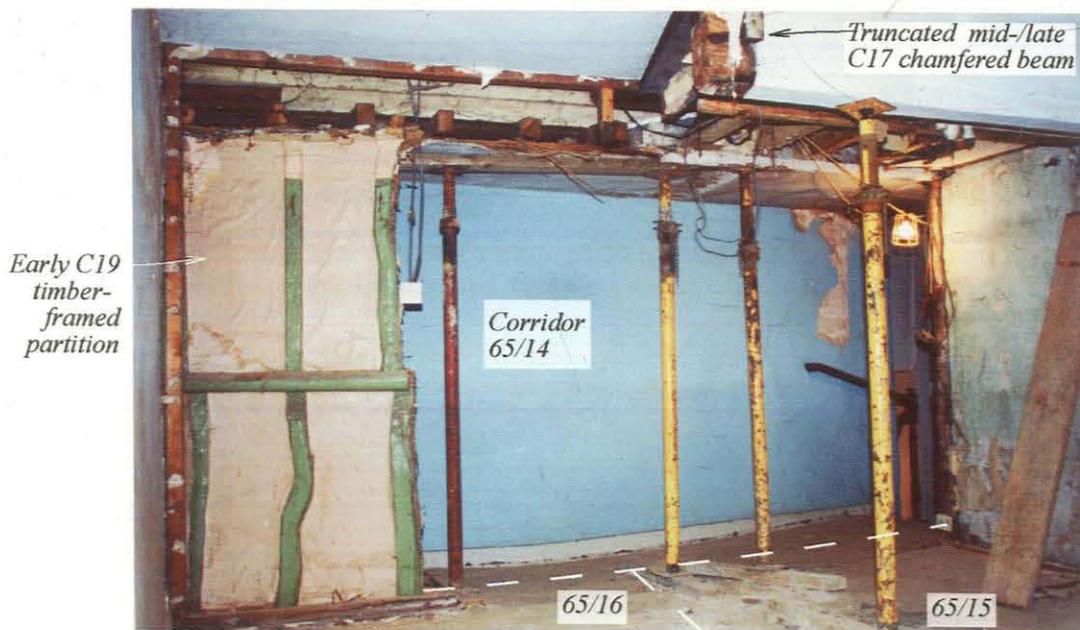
Rooms 65/14-16, no.65, looking east; view of first floor space after the removal of bathroom 65/15 partition panels. Note the truncated mid-/late 17th century chamfered beam and exposed timber-framed, east partition wall.
